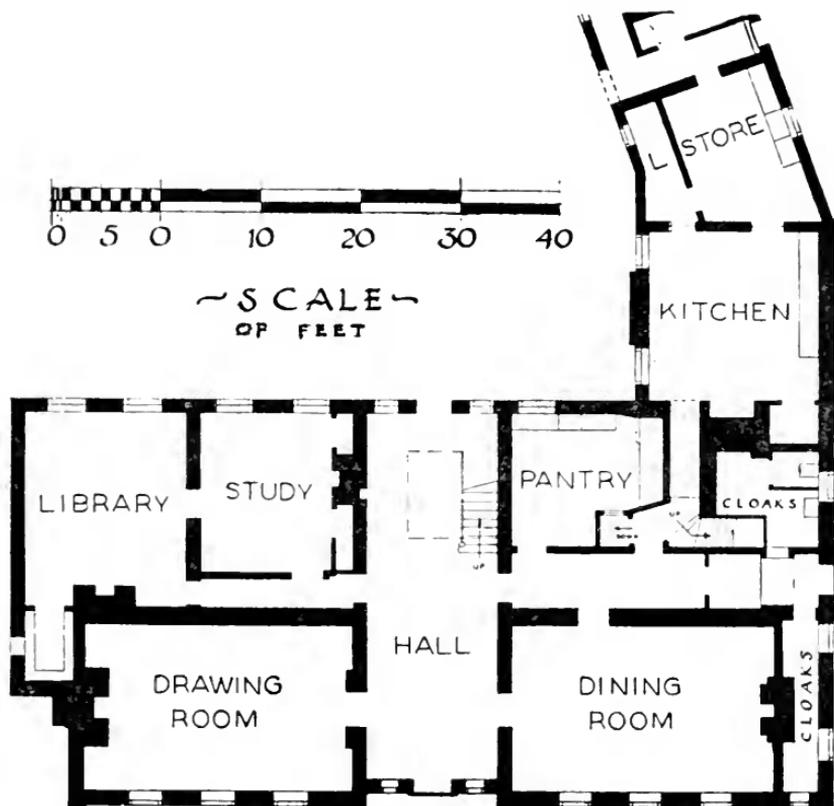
THE CEDARS, EPSOM: GROUND FLOOR PLAN
